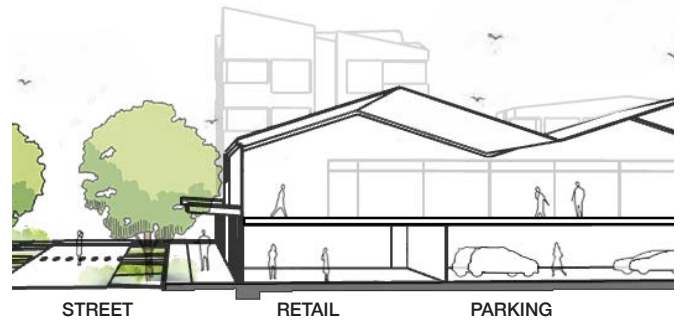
Village Centre Illustrative Section, sloped landform enables undercroft parking with retail frontage
